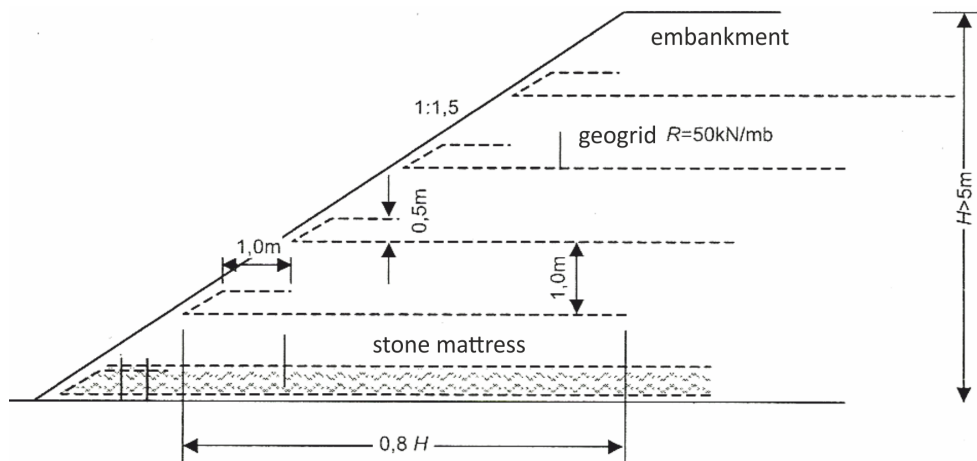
An embankment of $H > 5$ m in height, situated in a mining damage area, with horizontal reinforcement of the substrate (stone mattress) and additional geogrids in the escarpment area
